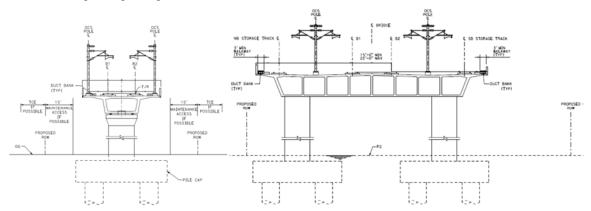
Typical Section in Subsection San Jose Diridon Station Alternative 2
